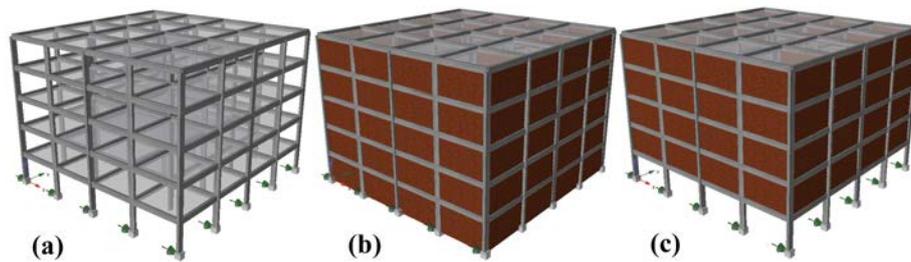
5-story model buildings, (a) without infill walls (bare), (b) with infill walls at all stories, (c) with infill walls-open ground story
